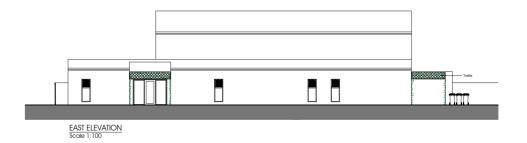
East elevation of scheme dismissed on appeal 19/04132/FULL1
